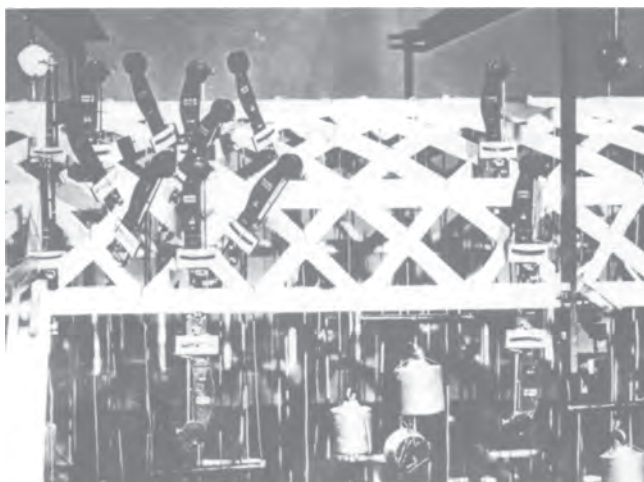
1:37.5 scale celluloid model of the reinforced-concrete hangars. Detail showing Huggenberger Tensometers (strain gauges) in place (see Section 13.4.2). (Image: ISMES Historical Archive)
